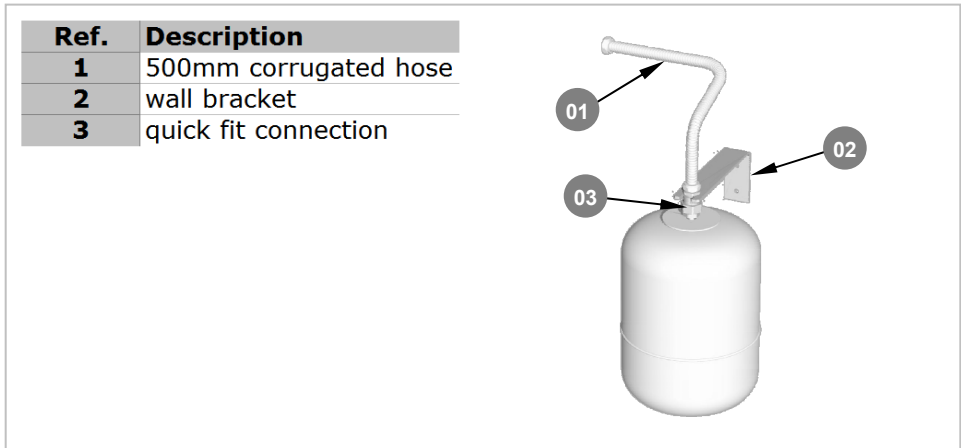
Components Dimplex solar expansion vessel fixing kit SOLVK1
